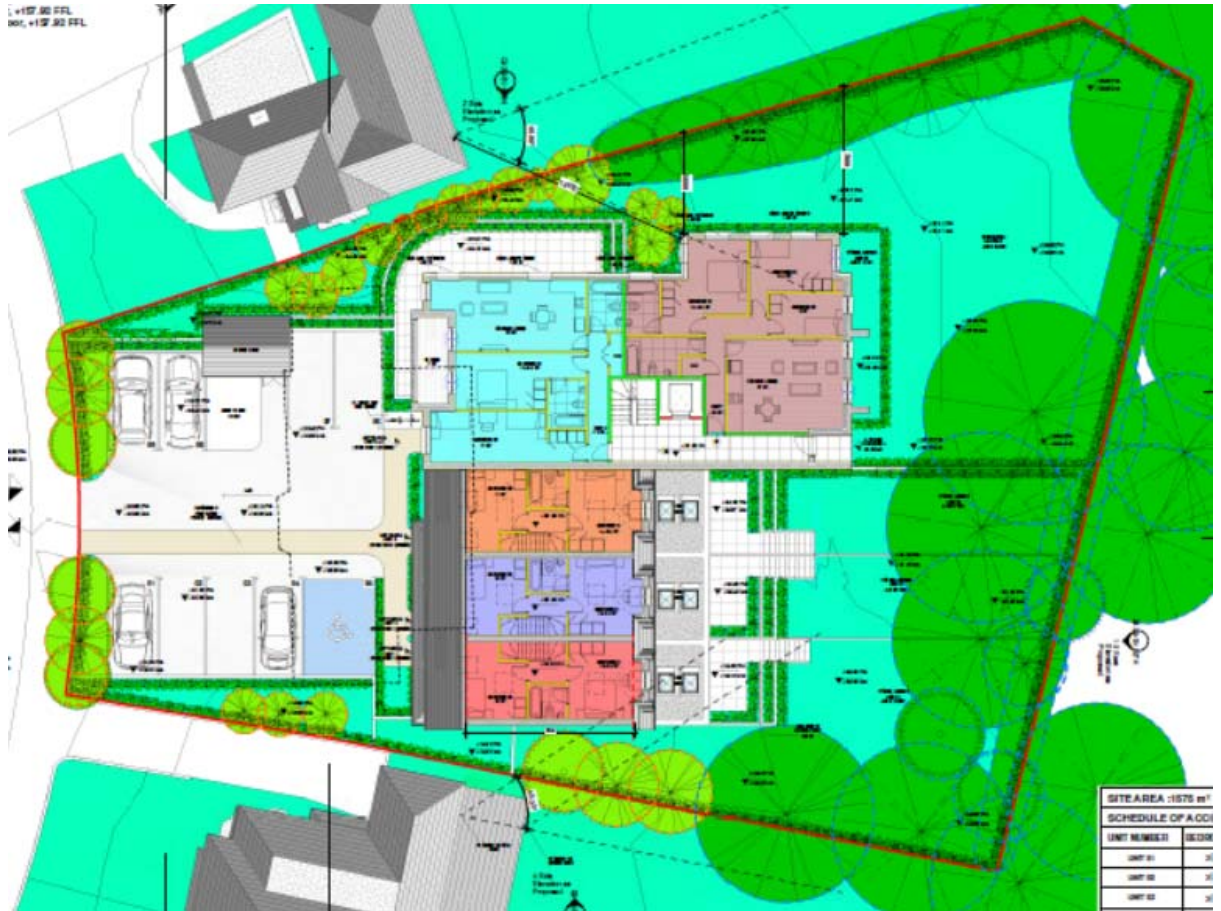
Proposed first floor site plan showing proposal in relation to neighbouring properties
